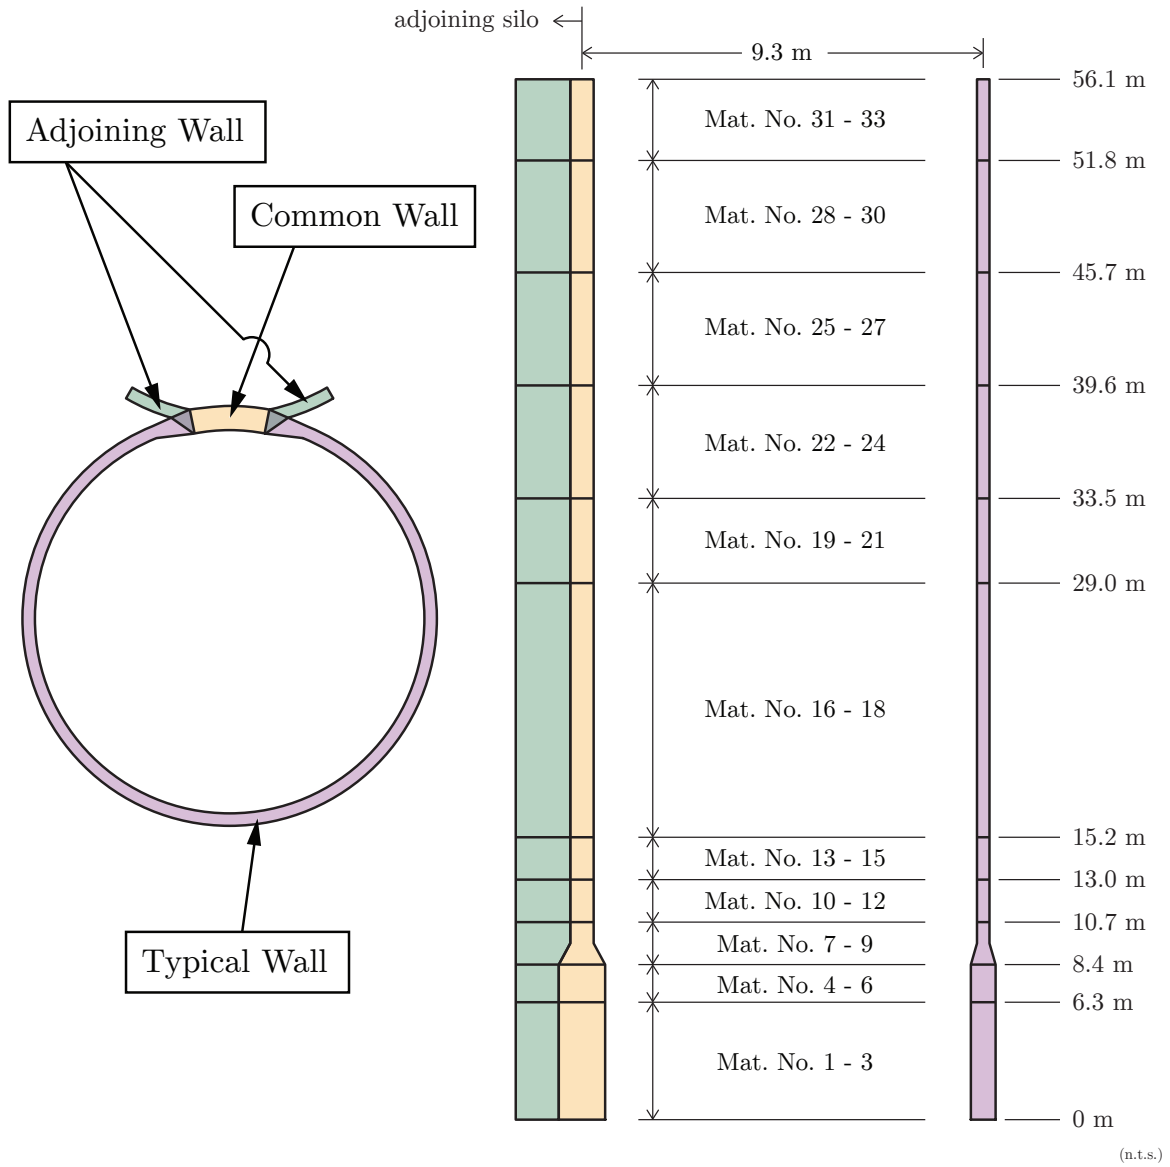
VecTor4 Example Model Plan and Cross-Sectional Details
